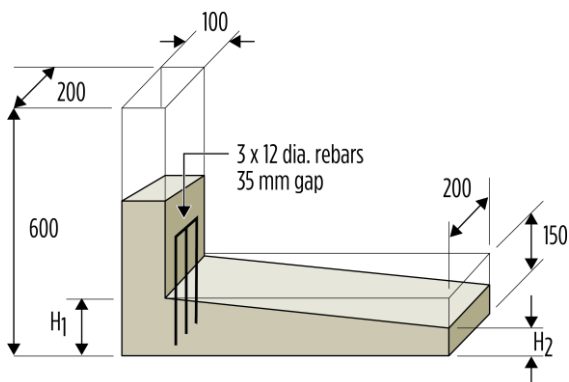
L-Box Method (all dimensions are in millimetres)
